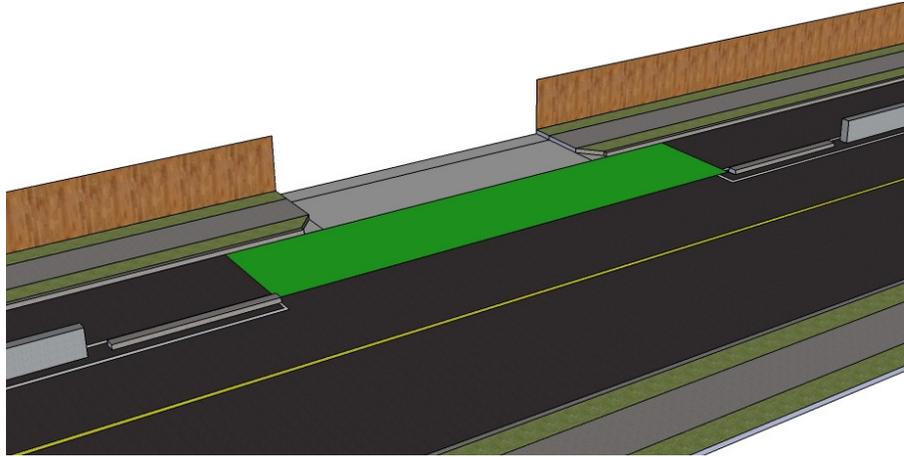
Concept sketch showing lane separation at driveway (looking south)
